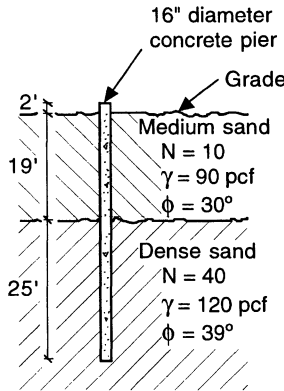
Example 8-6—Concrete pier in sand.
